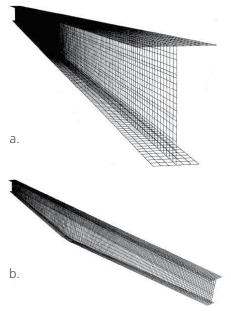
Bridge model, (a) drop in girder, (b) haunch girder
